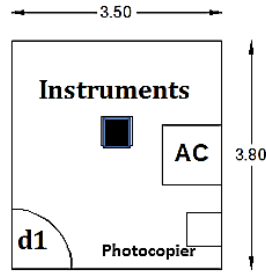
Plan view of the test chamber used for the experiment on synthetic building materials (Location_02- All the dimensions are in meters)
